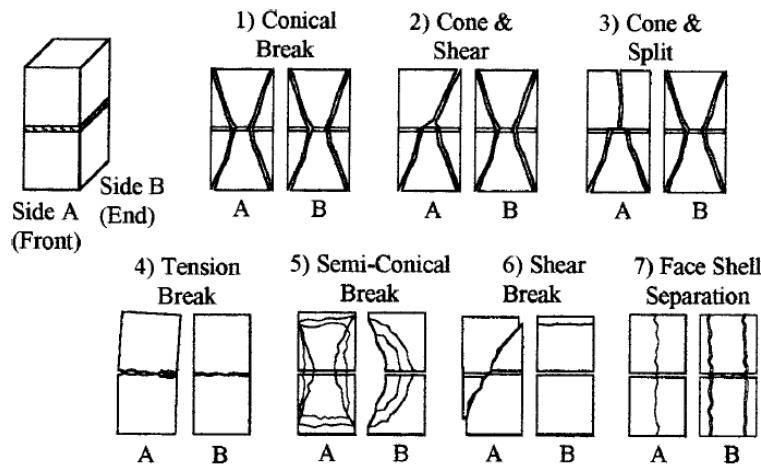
Masonry prism modes of failure (ASTM C1314, 2012).
